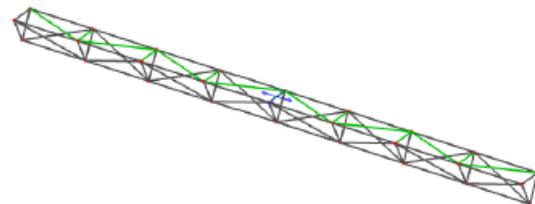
Illustration of secondary roof structure - three-sided spatial truss
